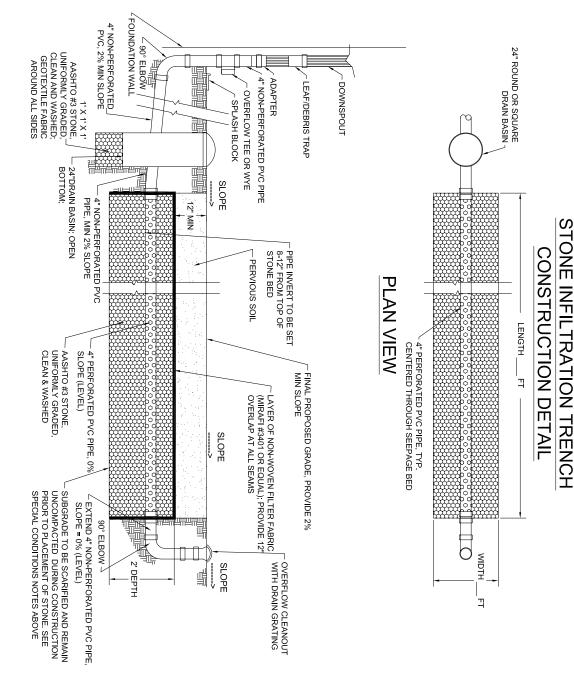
SIMPLIFIED STORMWATER METHOD - INFILTRATION TRENCH DETAIL
